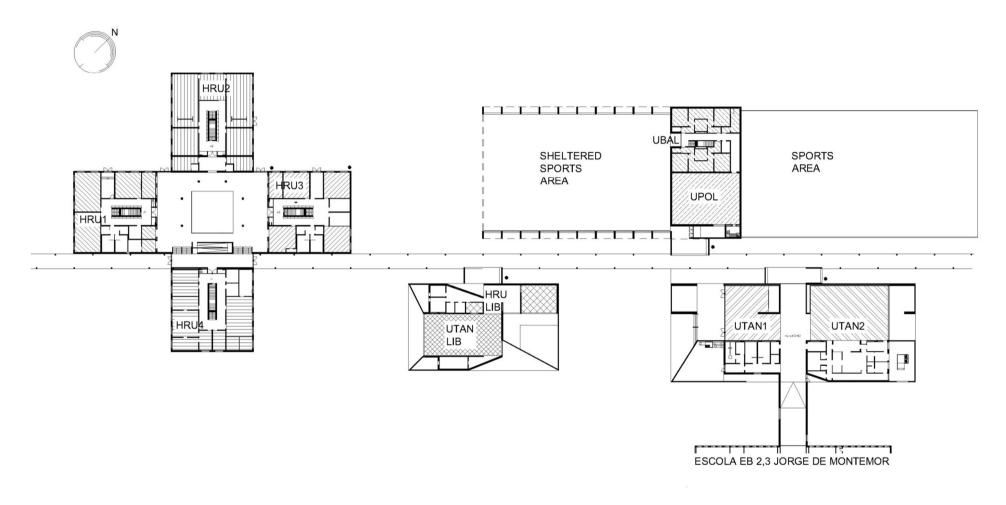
Simplified floor plan (level -1) of the various school buildings in MMV (A1 – S, Lib, Gym & Canteen) and main thermal zoning
